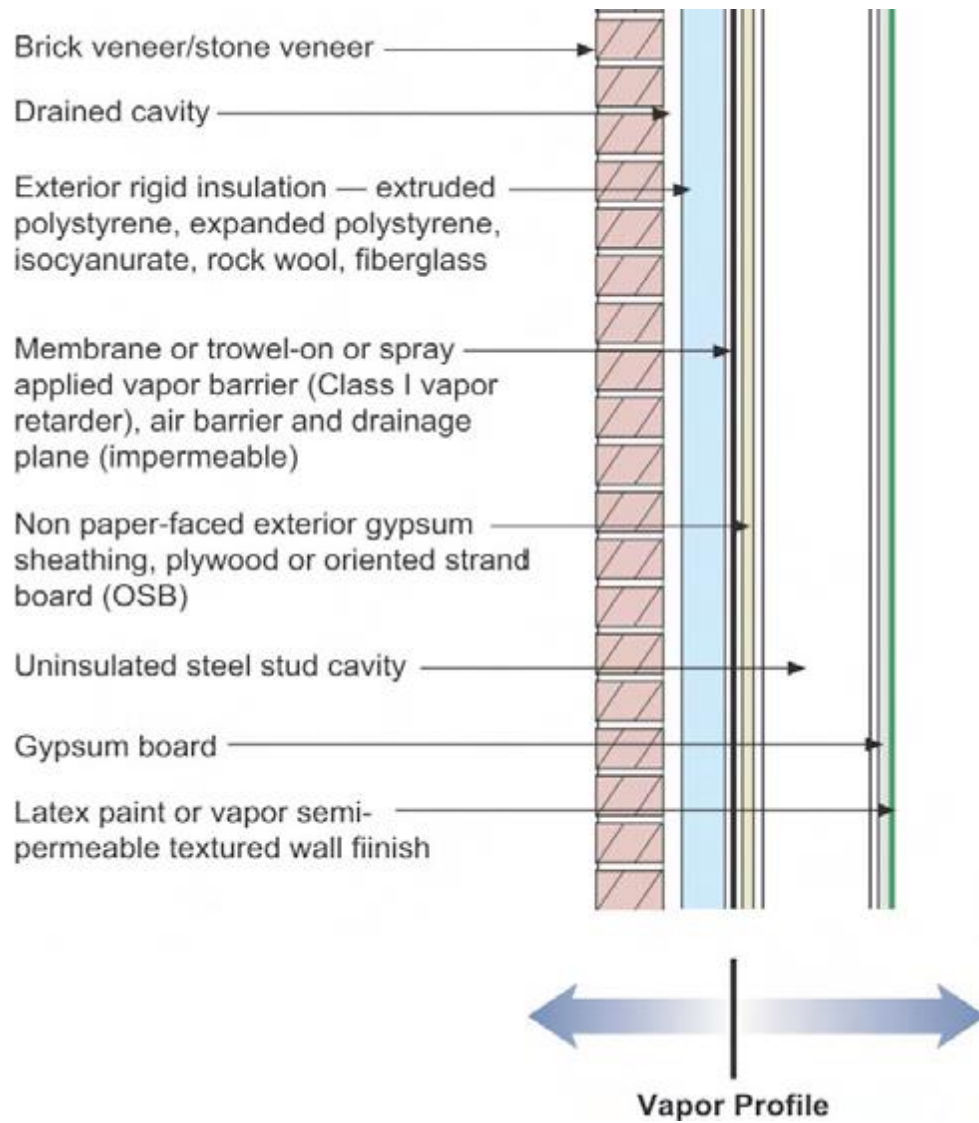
Frame Wall with Exterior Insulation and Brick or Stone Veneer (Joseph, 2005)
